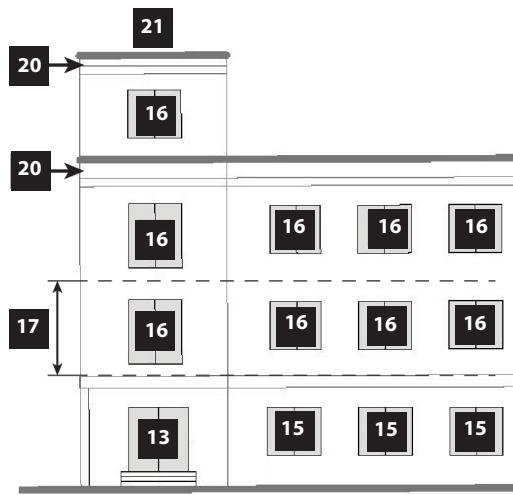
General building street facade diagram shown with corner tower, stoop entry type, and parapet roof type. Not to scale.
